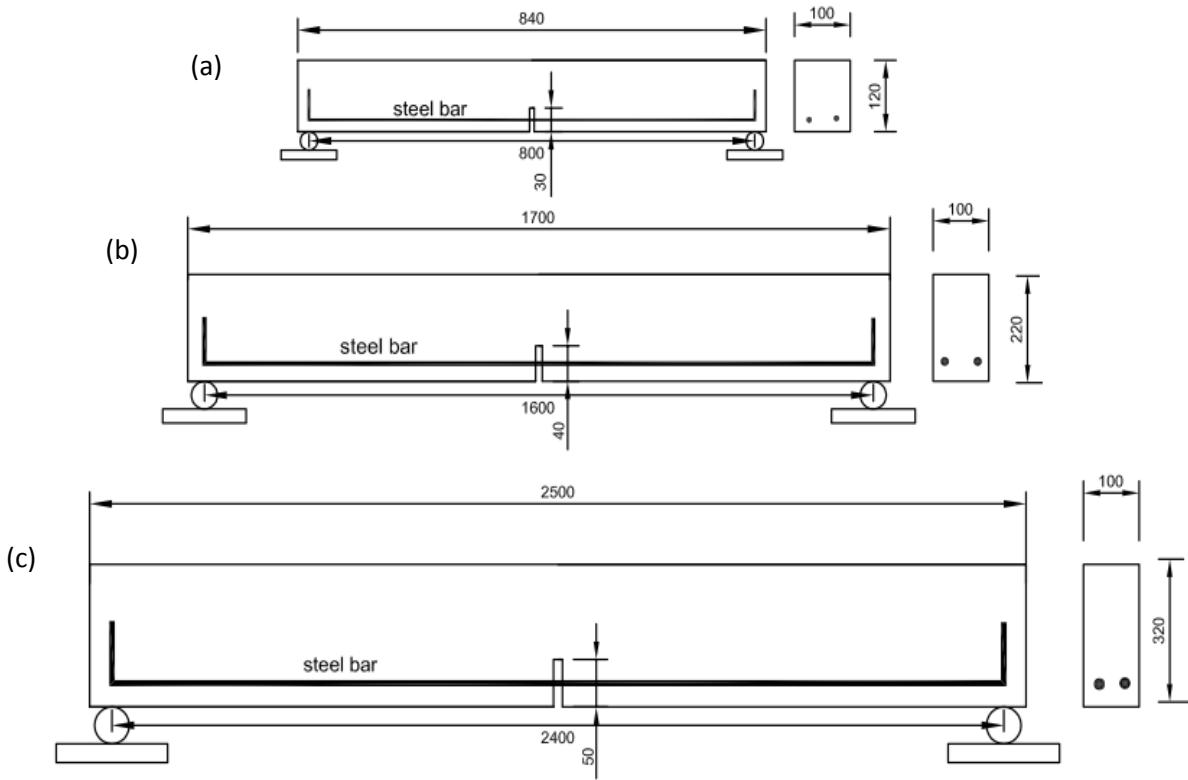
Test specimen layout (dimensions in mm); (a) small beam, (b) medium beam, (c) large beam
